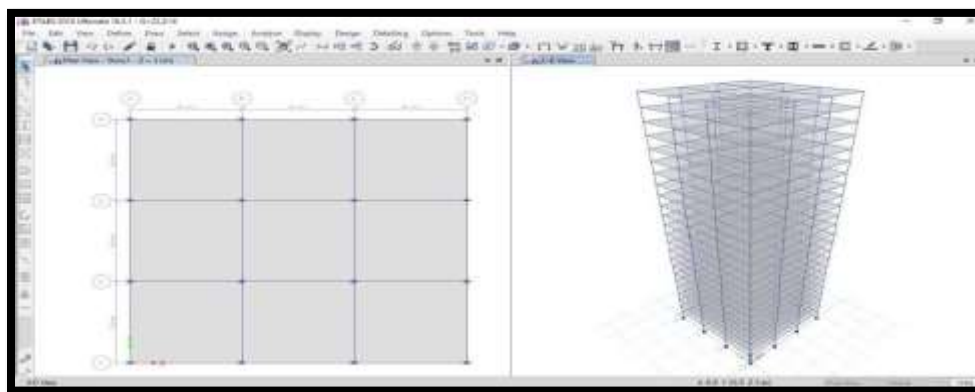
Plan and 3D view of (G+22) building without shear wall case
